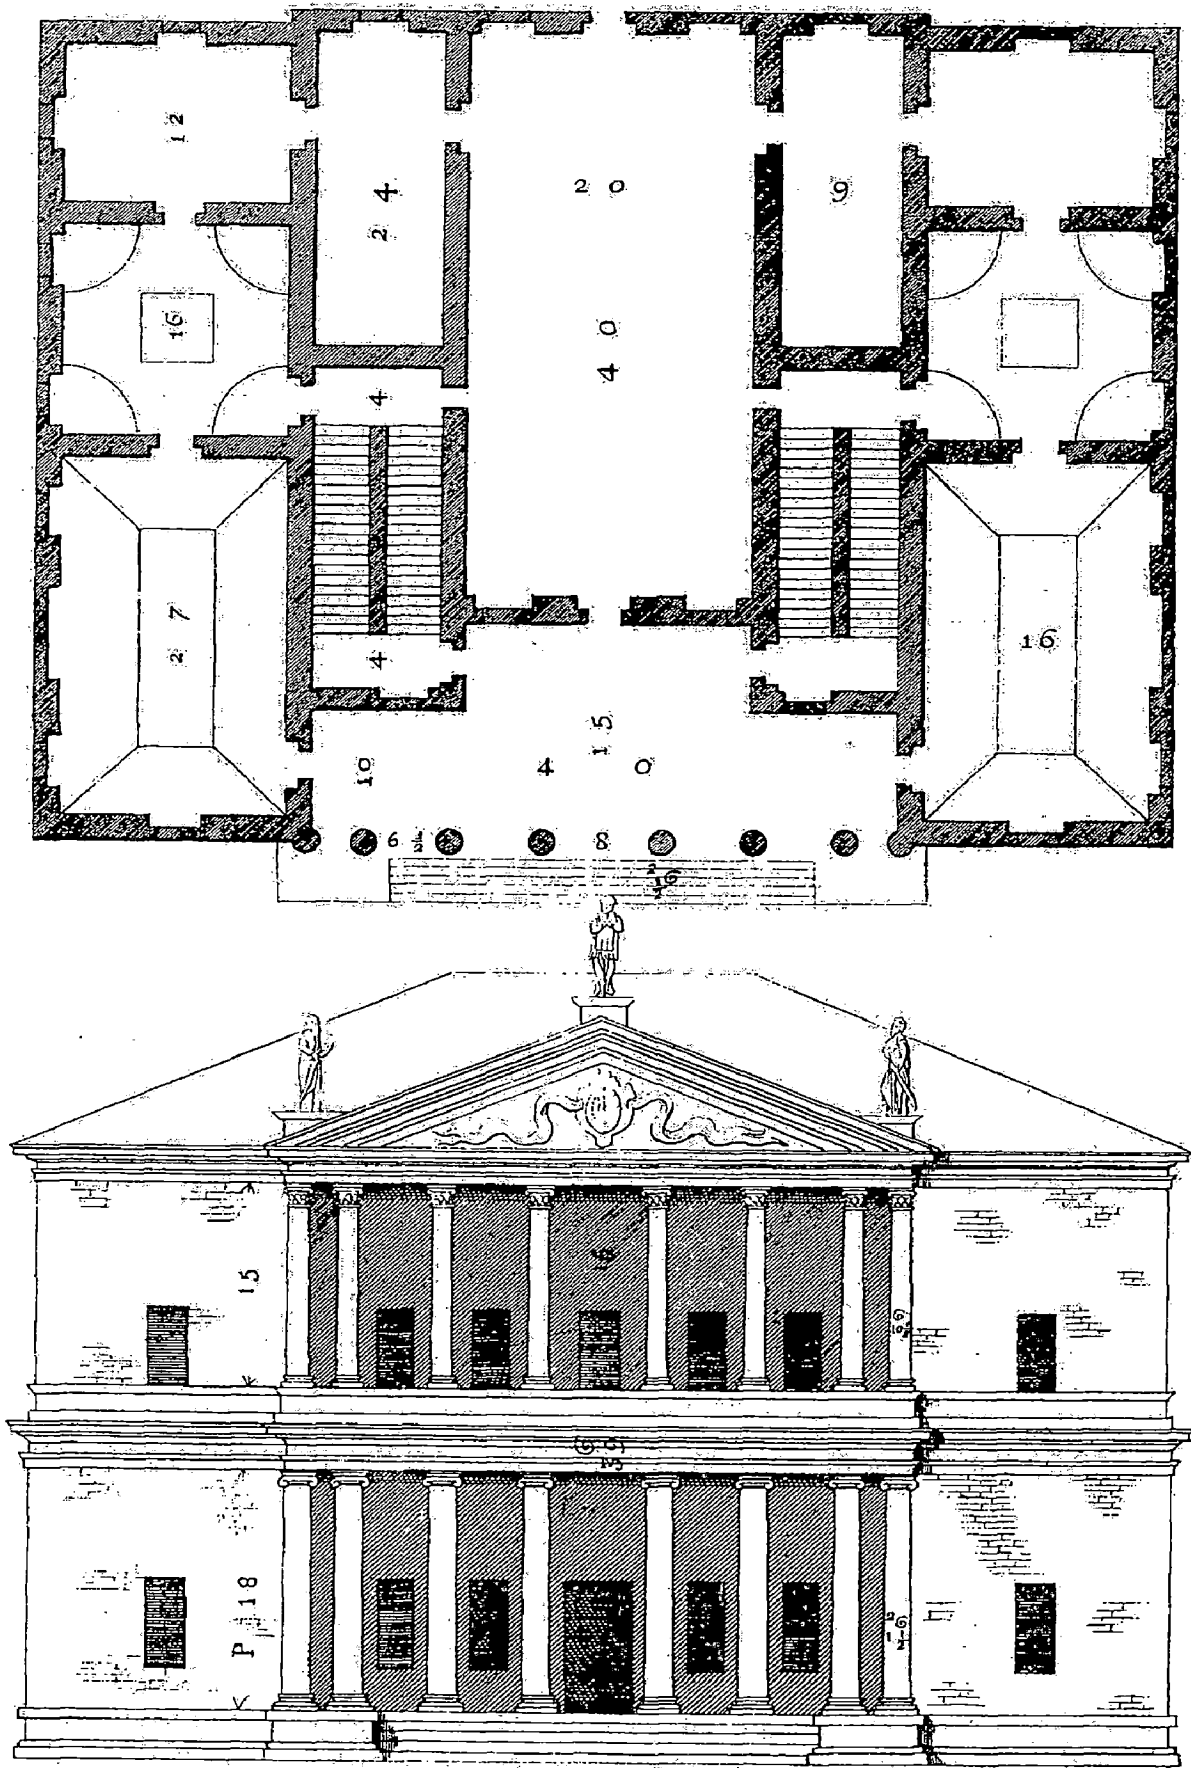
Villa Anibale Sarego at La Miega in plan and elevation
